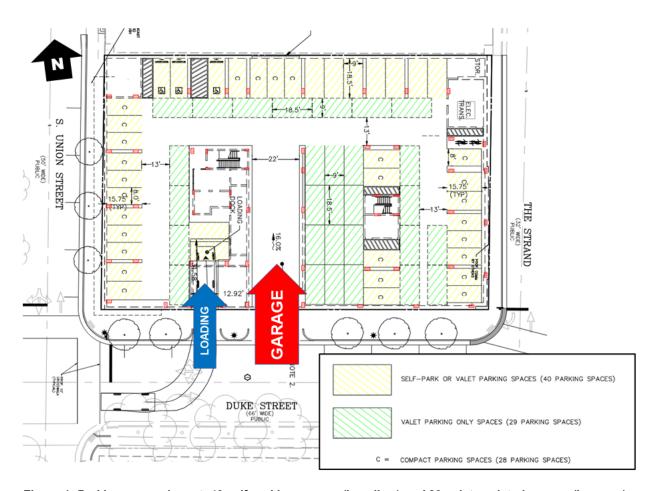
Parking garage layout: 40 self-parking spaces (in yellow) and 29 valet-assisted spaces (in green).
